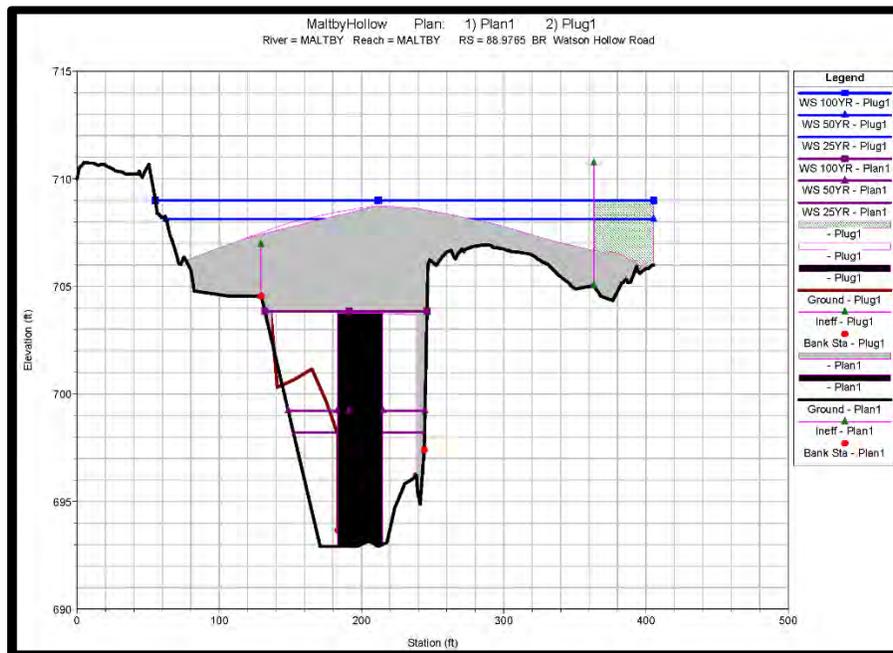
Section View of Existing and Proposed Maltby Hollow Bridge
